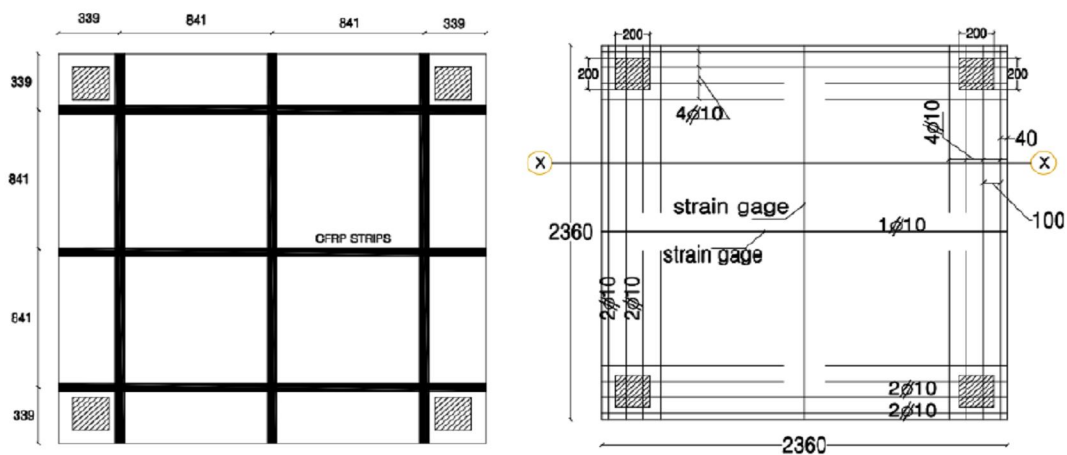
Specimen Dimension, reinforcement, and CFRP Strips Locations
